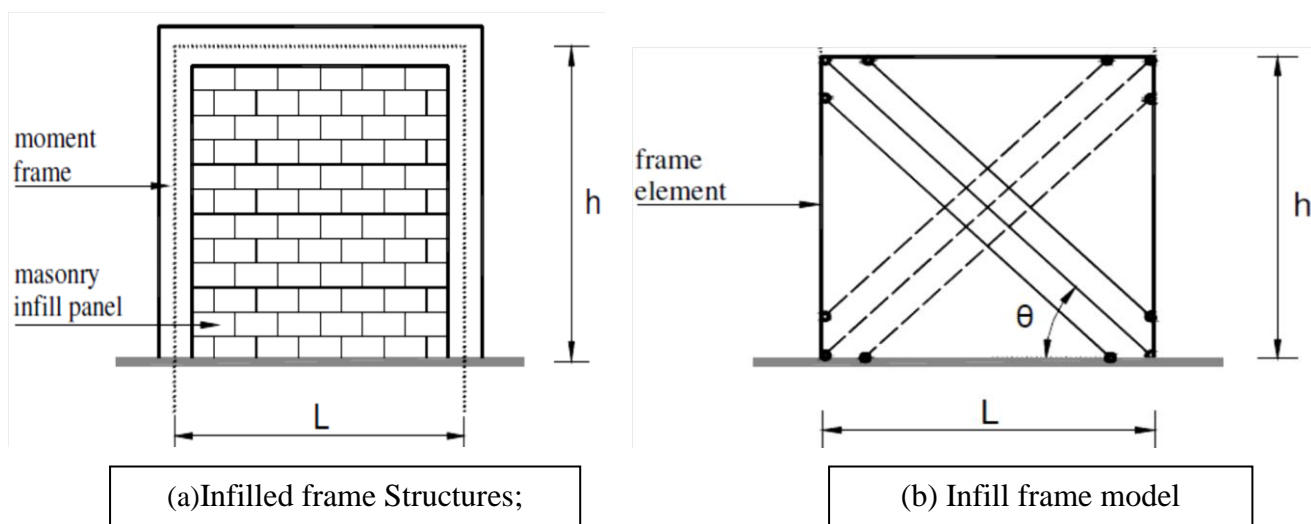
Six-strut model for masonry infill panel in frame structures: Asteris, P.G(2008)
